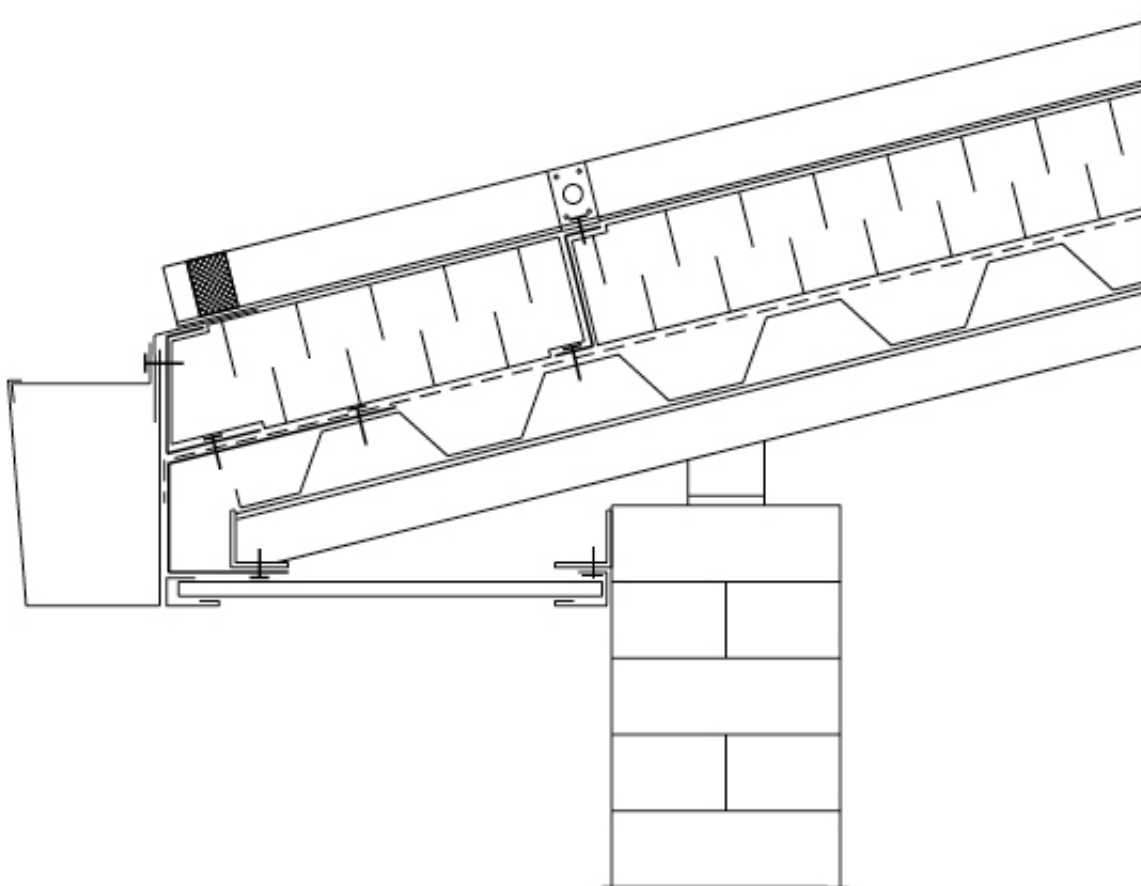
B: Eave - Eave with GutterInstallation/Assembly Notes:
